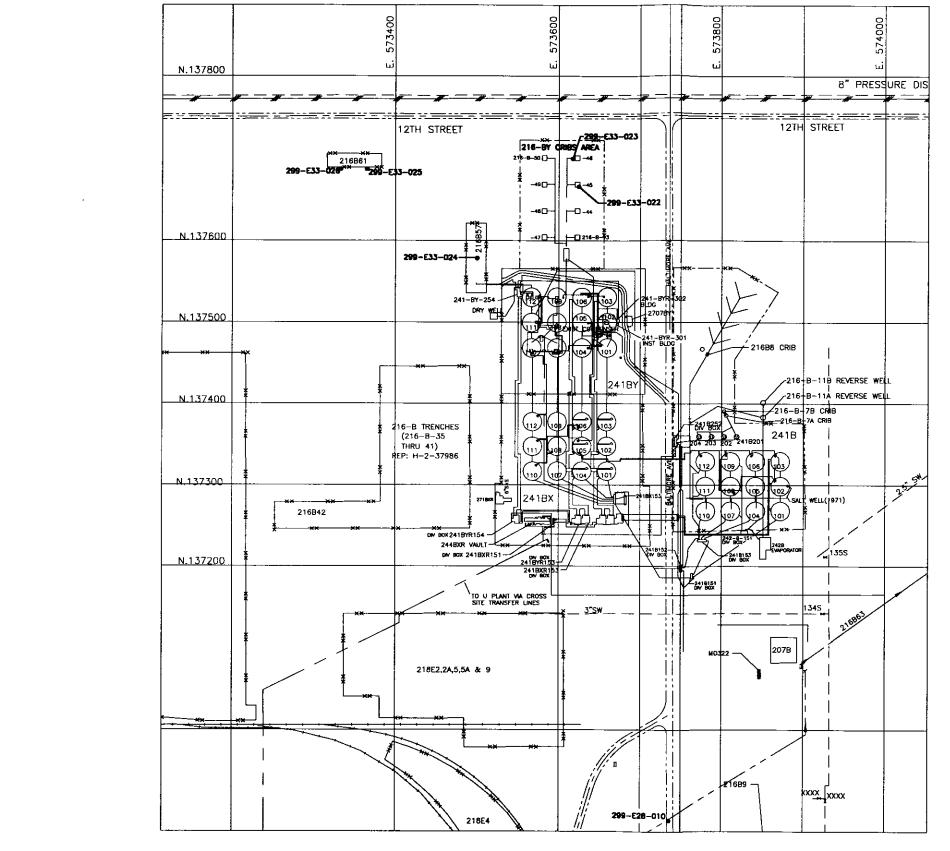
, SH 2 FACILITIES CONSTRUCTED FOR IN-TANK SOLIDICATION, 1965-1974 (WELLS)
